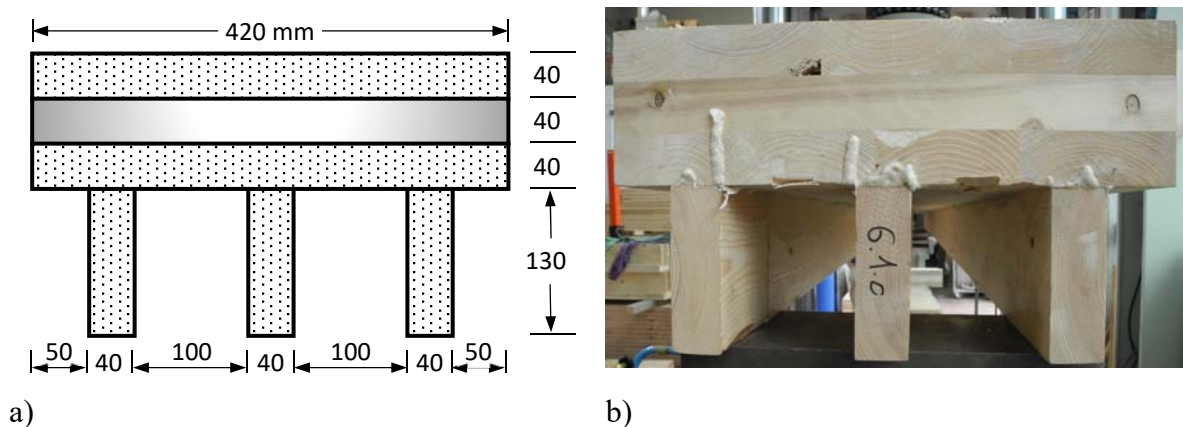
Cross-sectional build-up of investigated ribbed element a) dimensions b) view of glued composite
